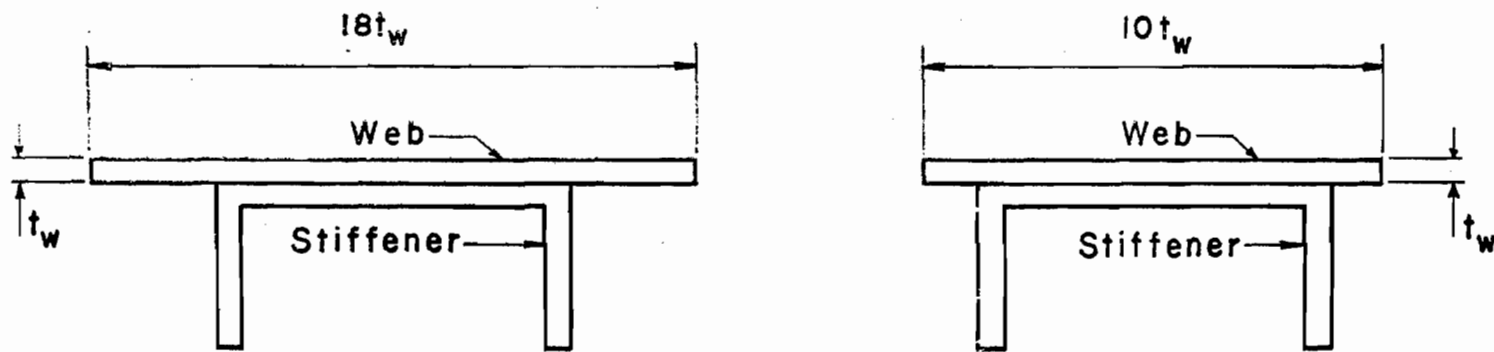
Effective Widths of Beam Webs for Transverse Stiffeners Under End Crushing Failure
